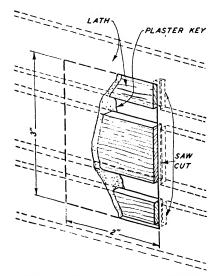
Wall Construction Showing Location for Cutting Opening in Plaster for Switch Box
